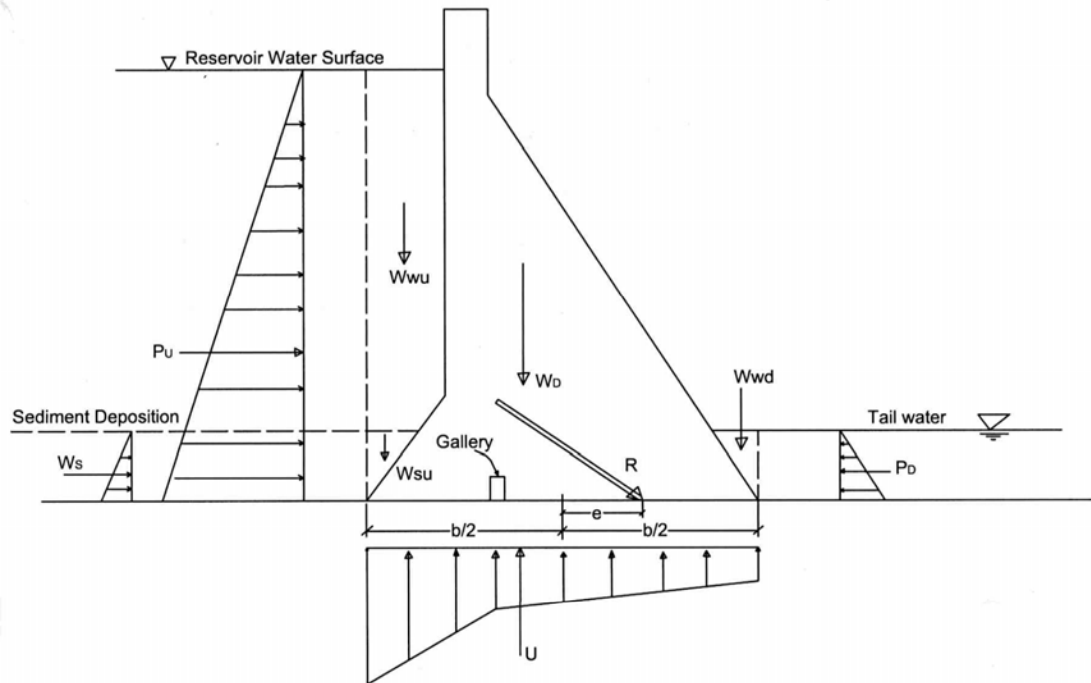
Typical section of a gravity dam & forces acting on it
